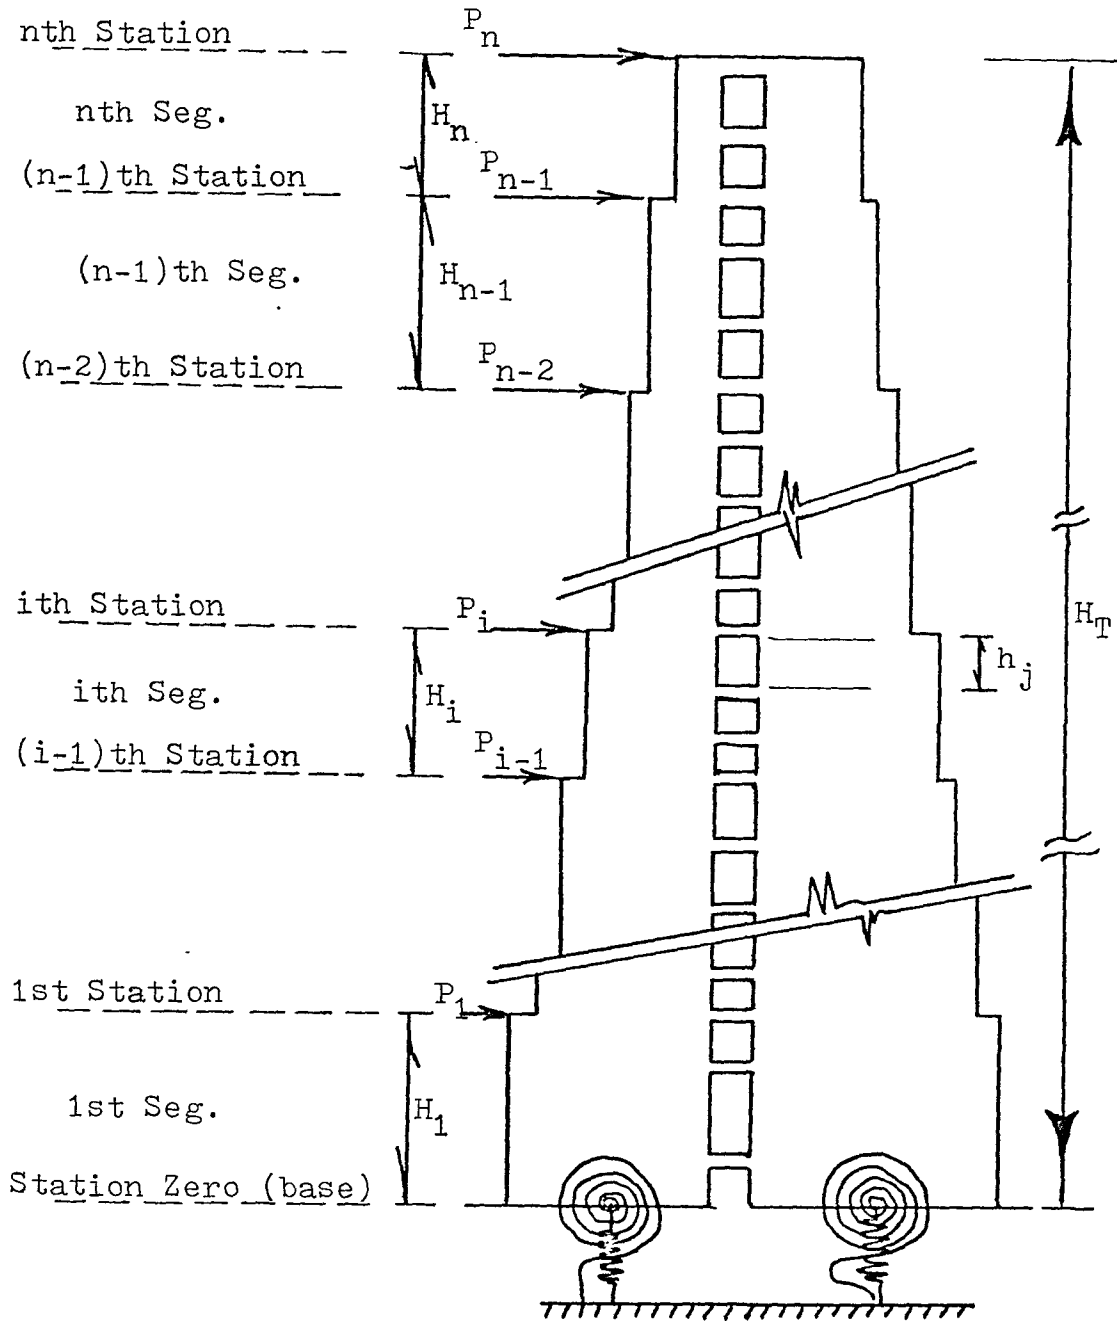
STEPPED COUPLED SHEAR WALL ON FLEXIBLE FOUNDATION
